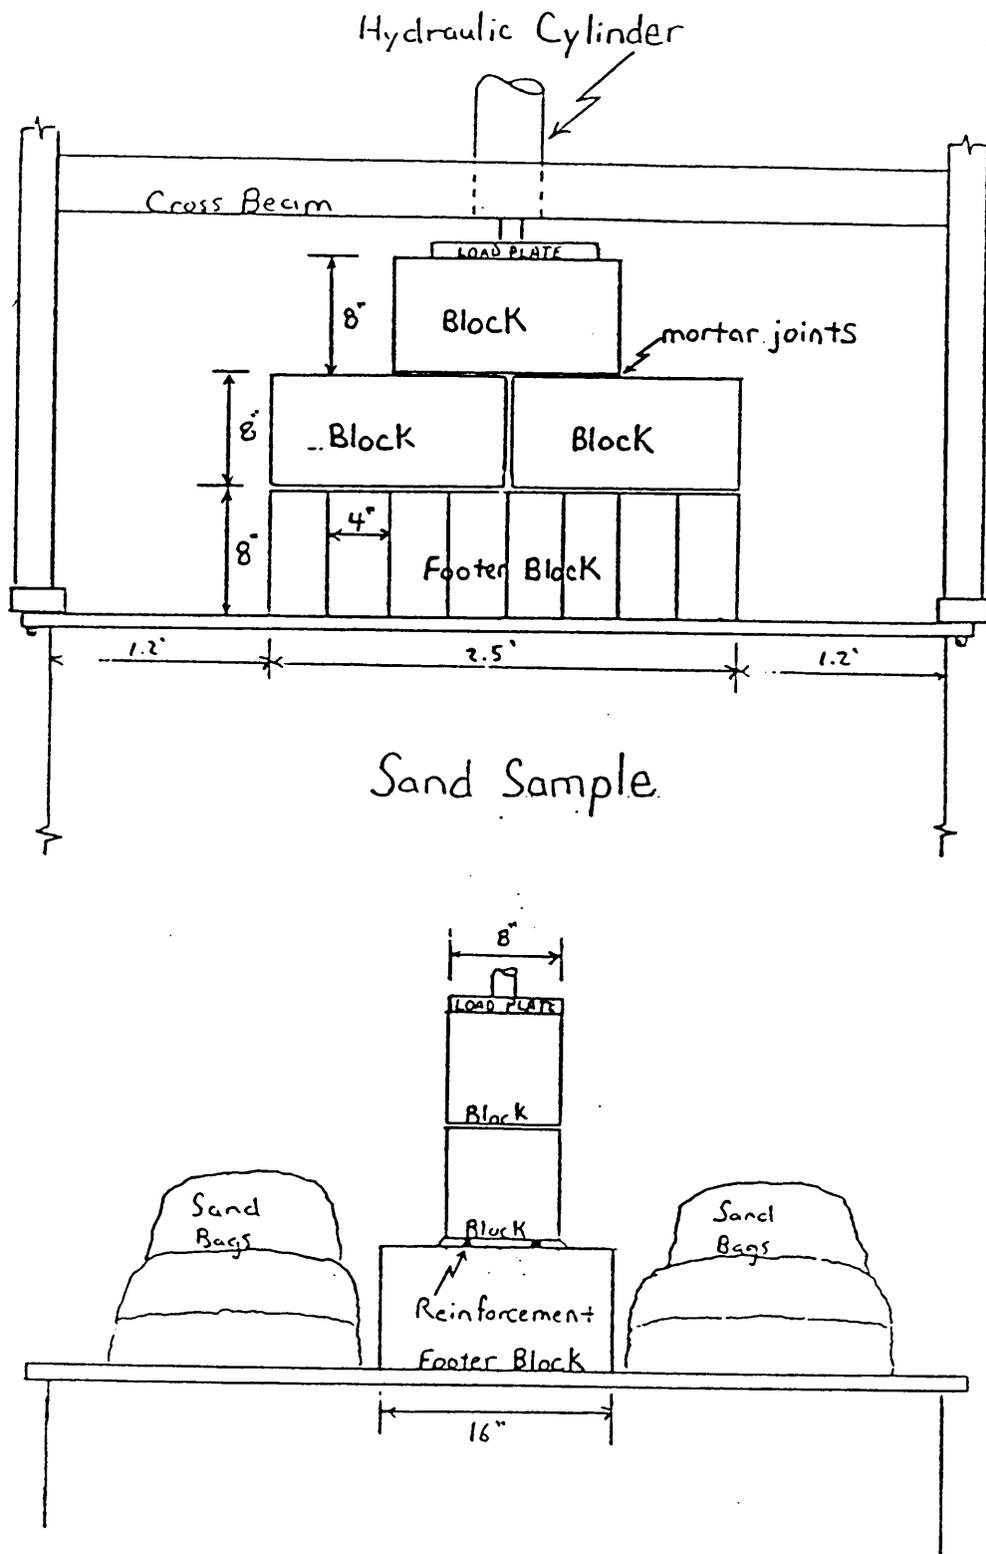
Cross Sections of Footing Model. Scale: 1"-1'
